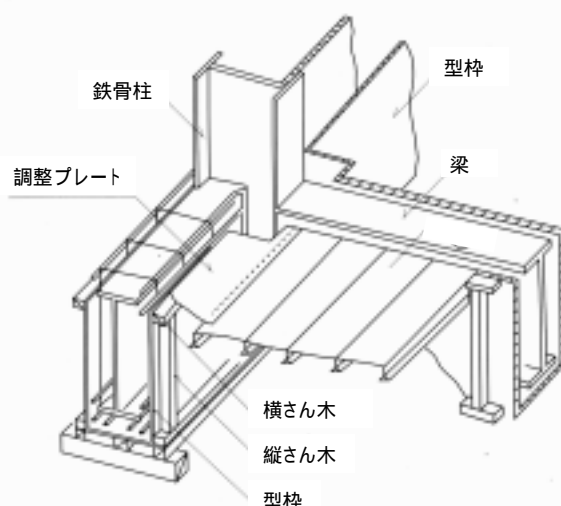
Flat decks for steel and reinforced concrete combination structures.
